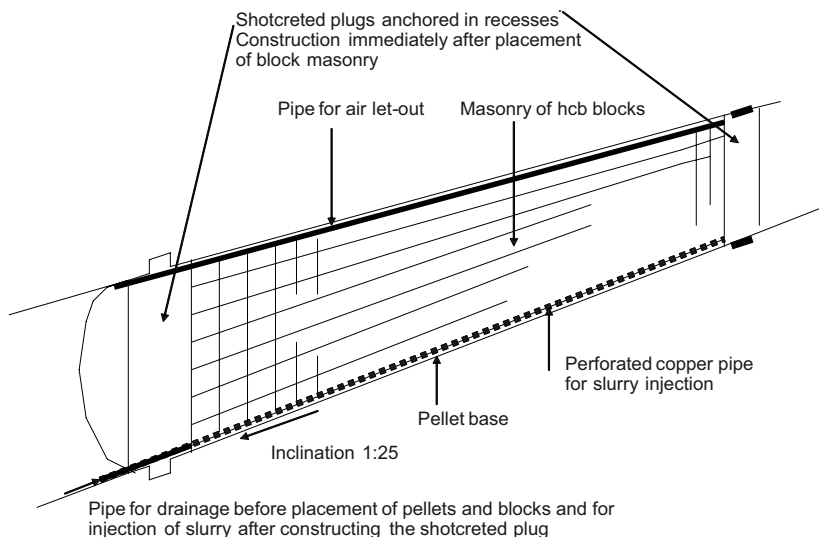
Principle of constructing a block masonry in a KBS-3V tunnel segment under drained conditions and subsequent injection of clay mud. The deposition holes are not shown
